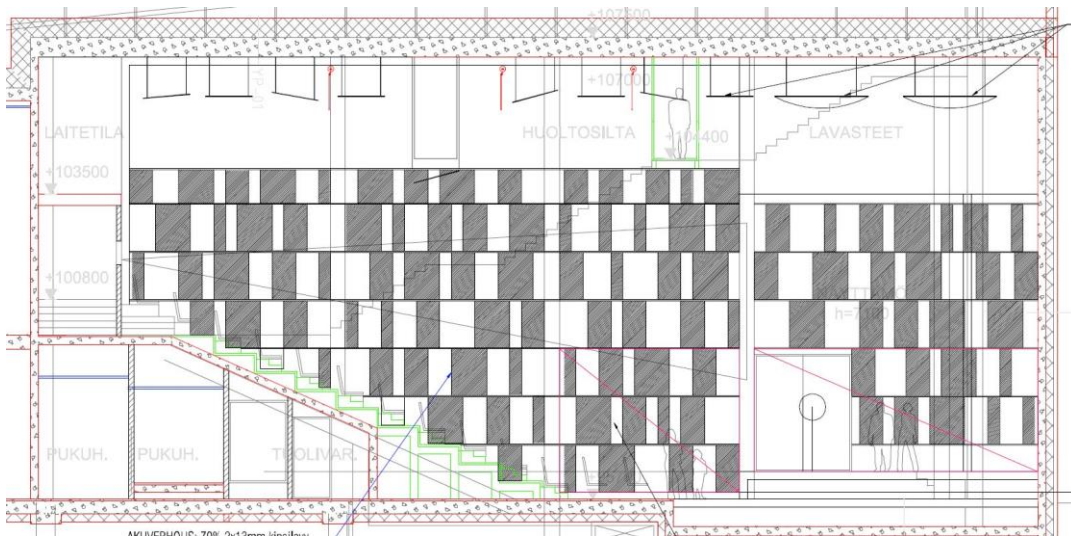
Kangasala-hall, section drawing. The steep audience area and its construction.
